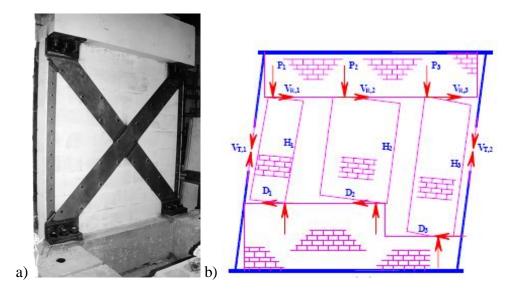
(a) Wall strengthened with steel X-braces, (b) piers exhibiting rocking behavior
